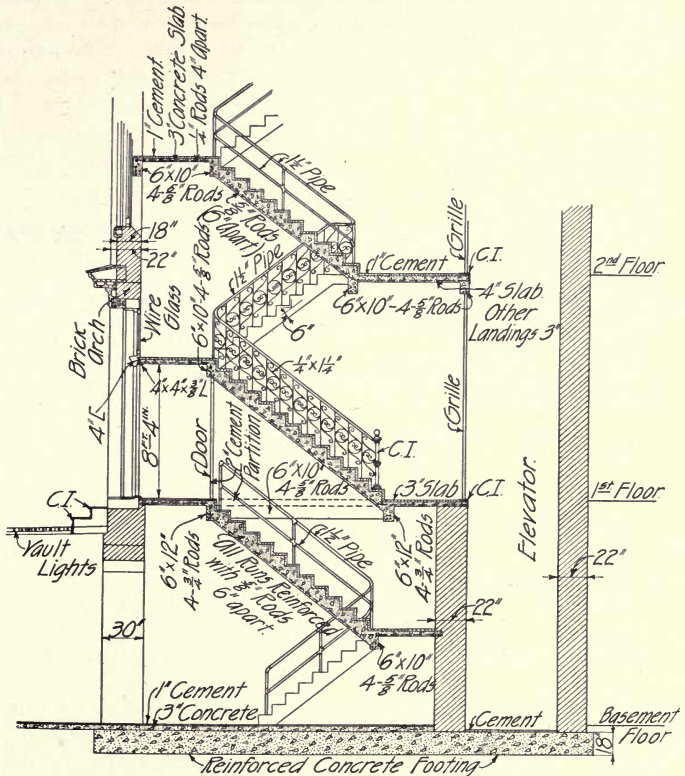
Stairs in Ketterlinus Building. (See p. 67.)
